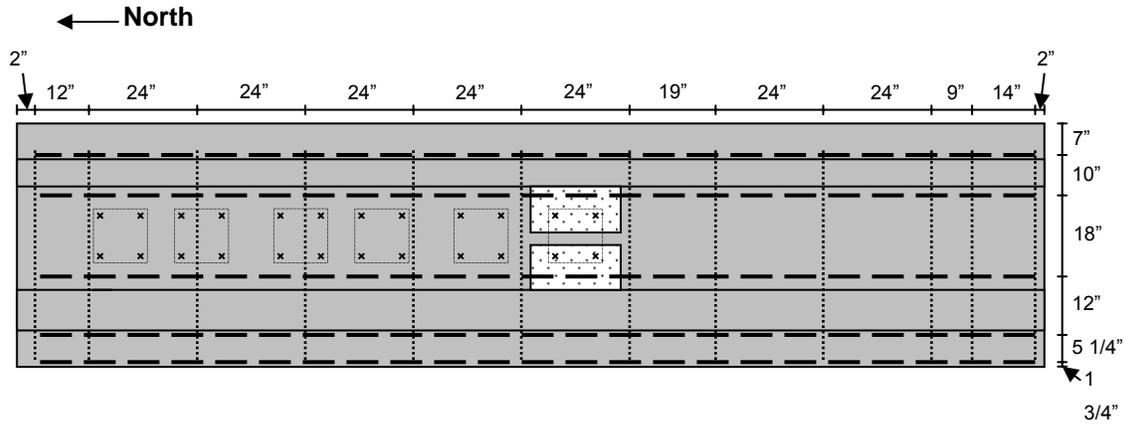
Side view of formwork, steel reinforcement, and access panels
